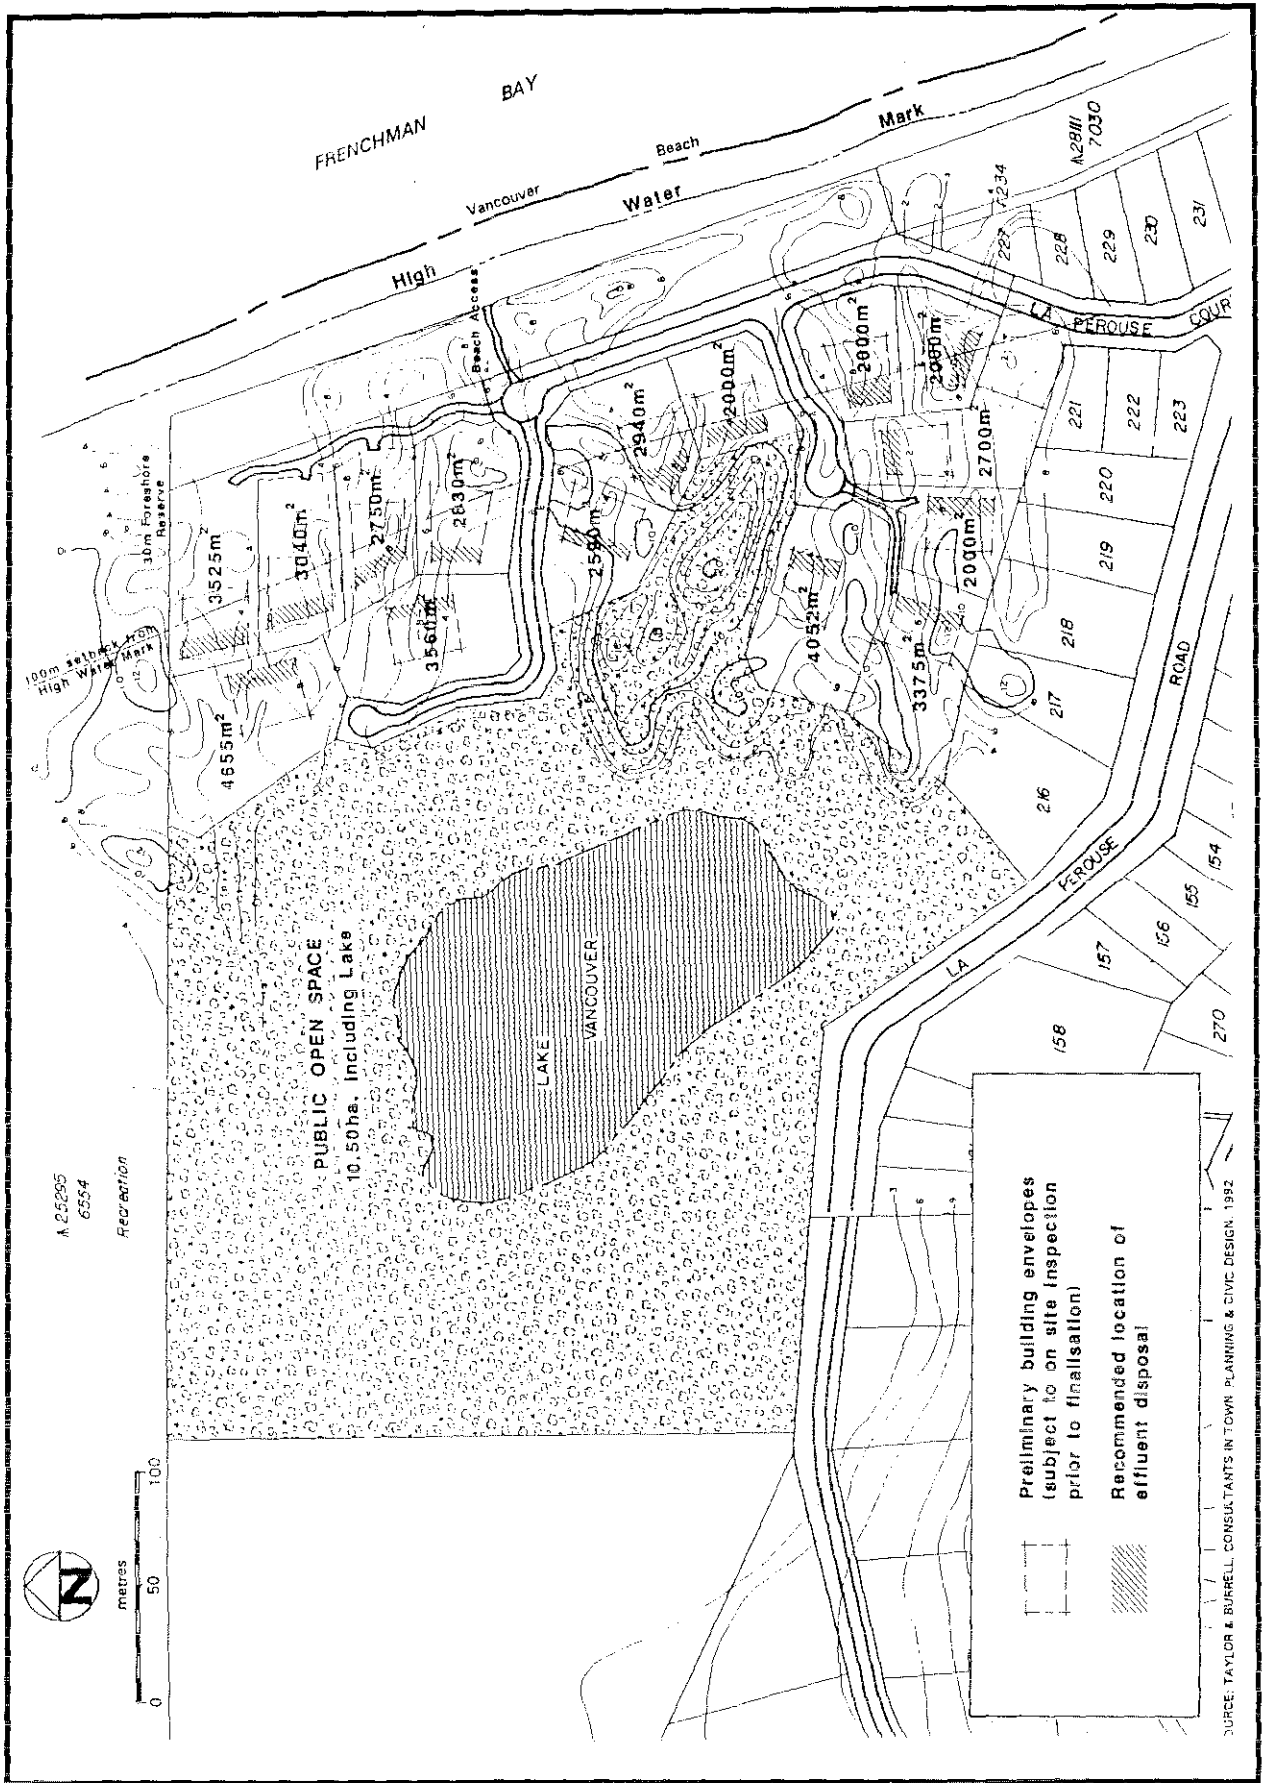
Plan of subdivision (from Alan Tingay & Associates, CER)
